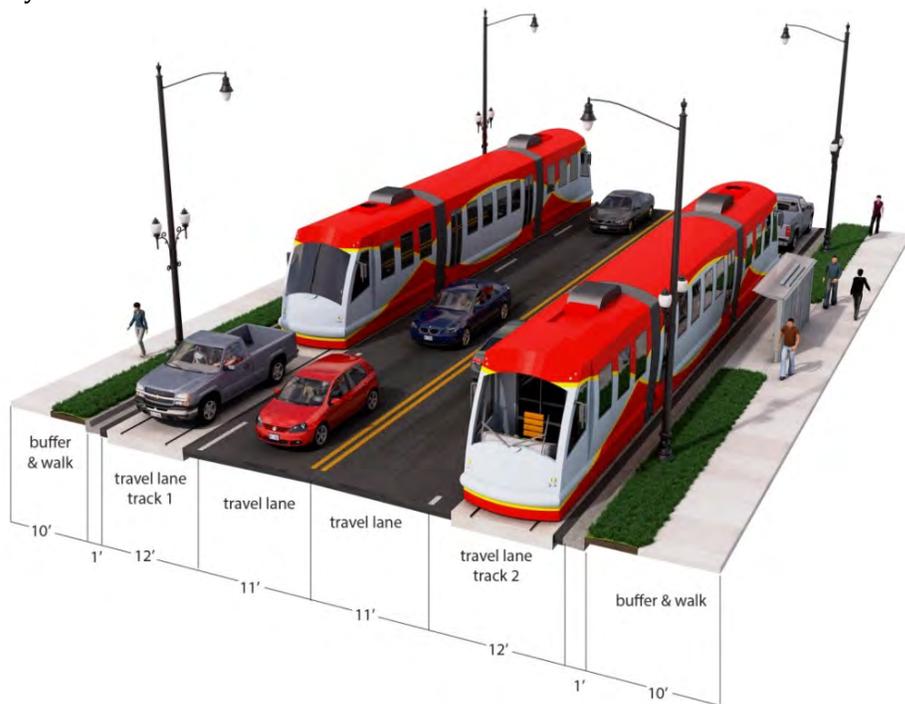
Curbside Running Typical Section (Option 2- Shared Travel Lane)
